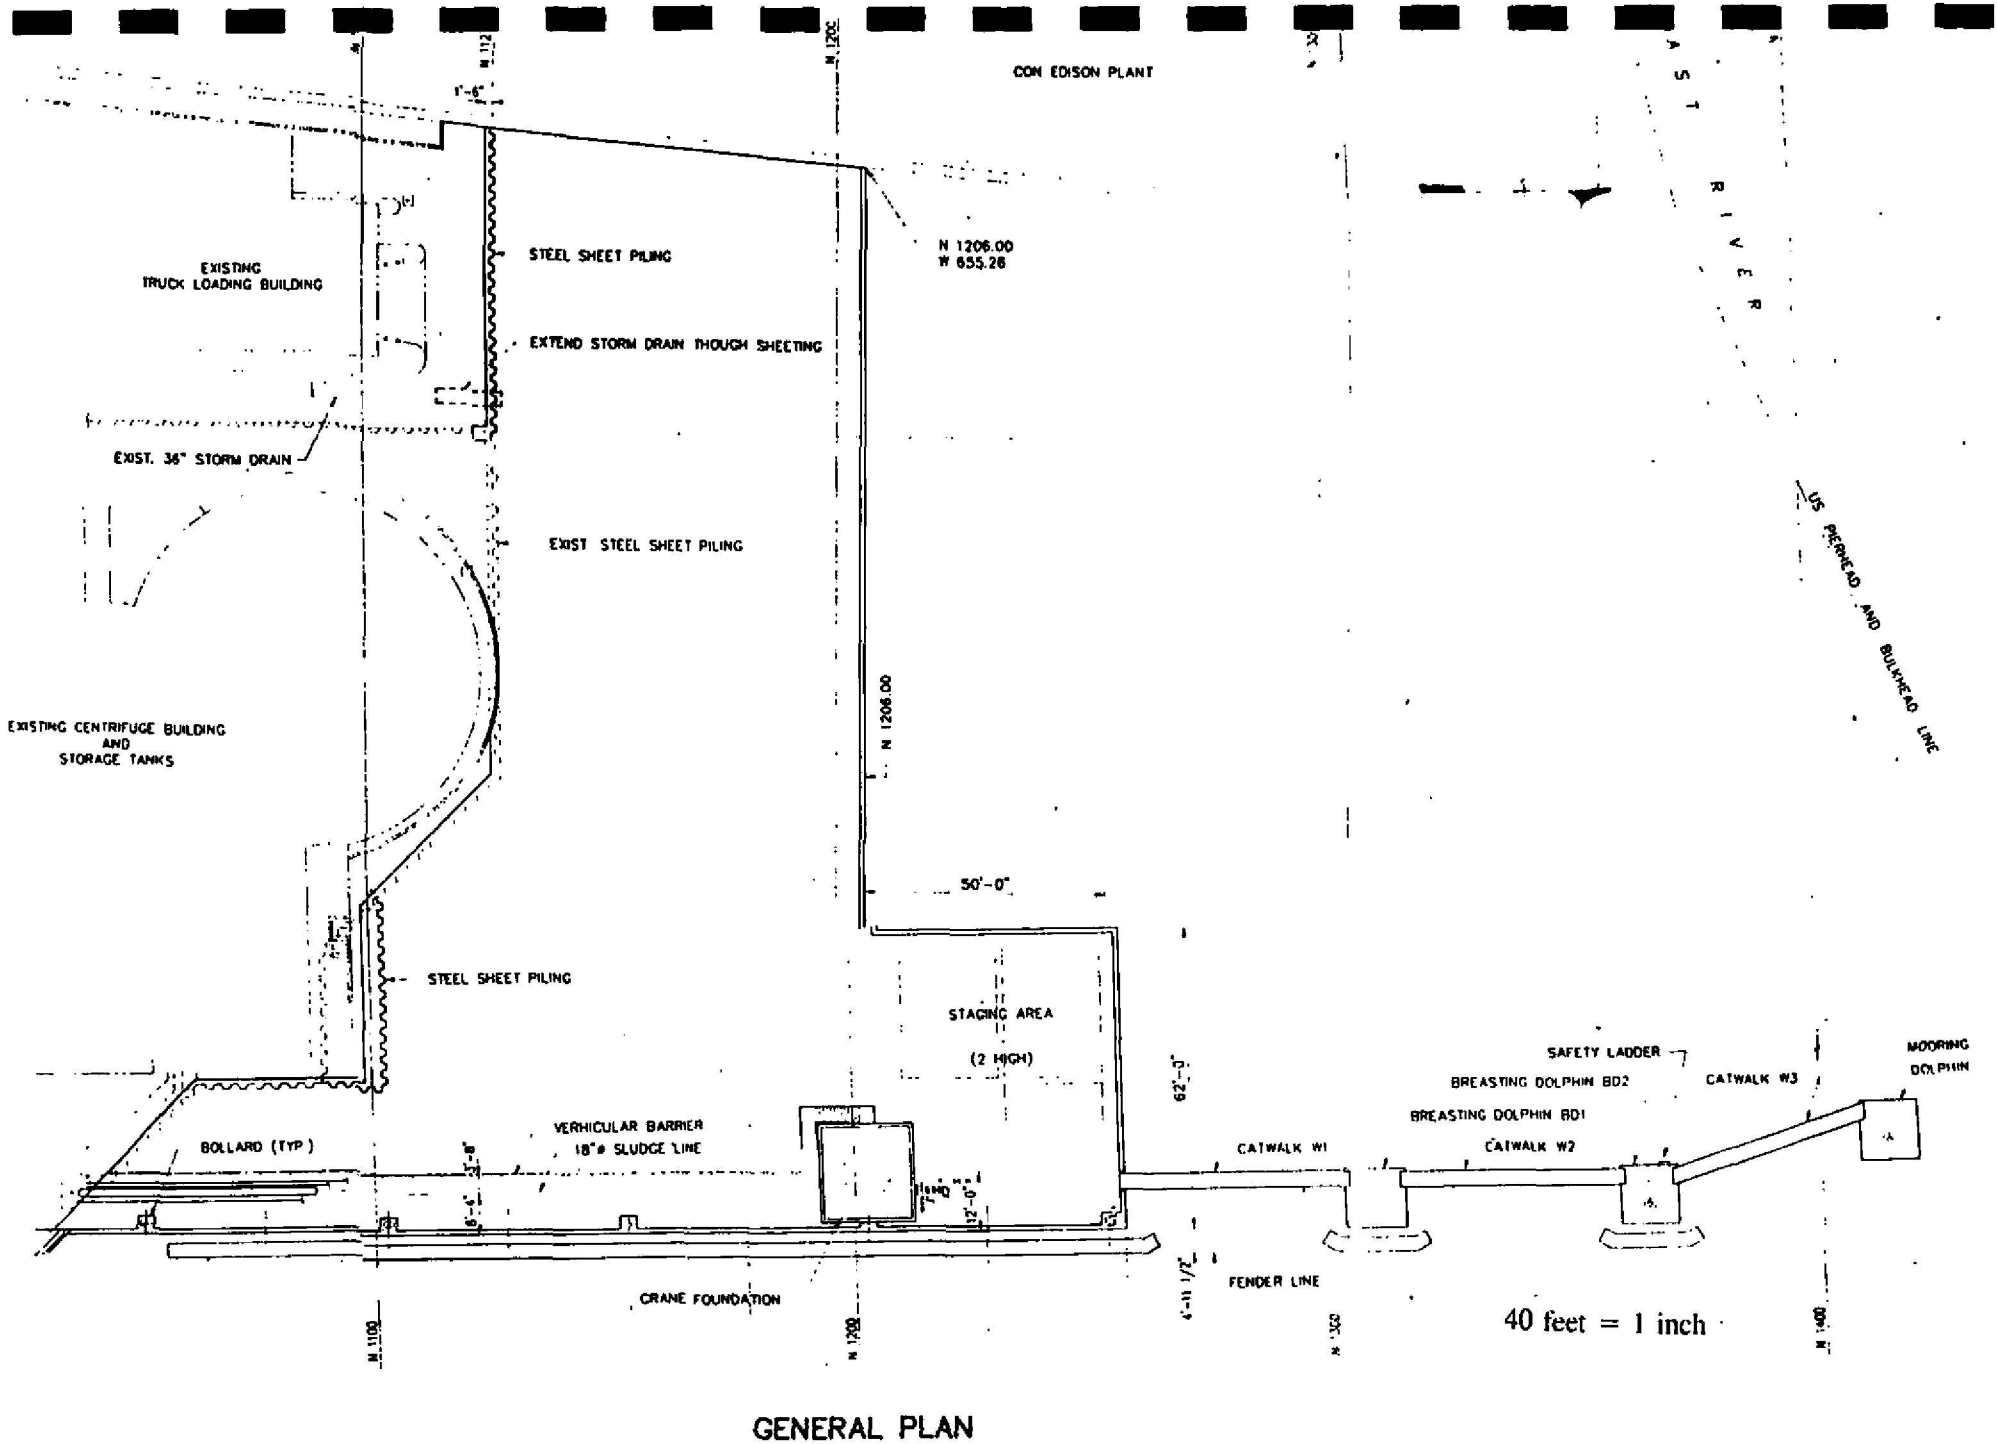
Red Hook Water Pollution Control Plant General Design Plan.
